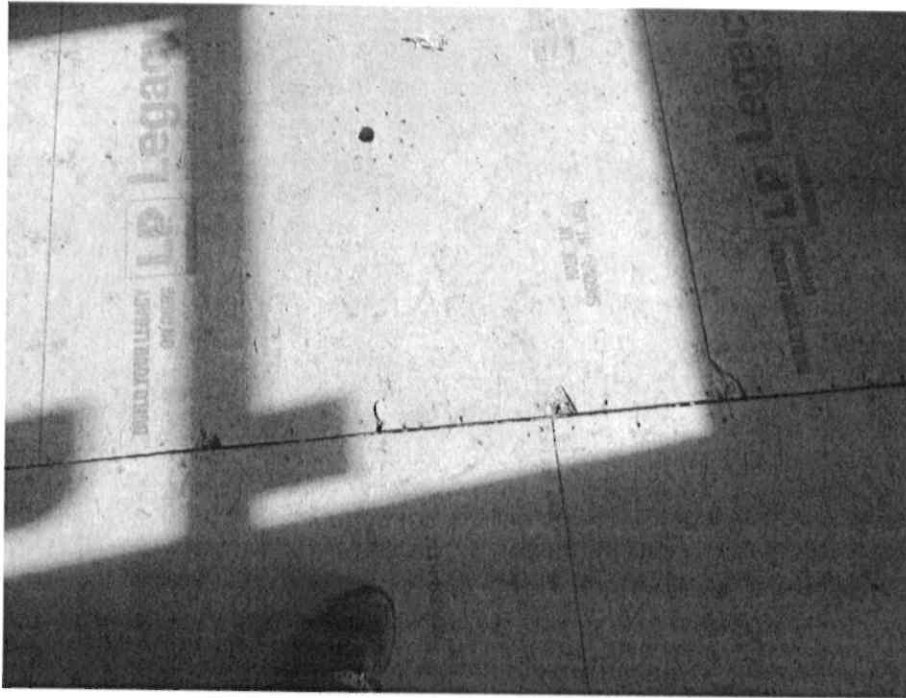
View of the OSB spalls within the Living Room area.
